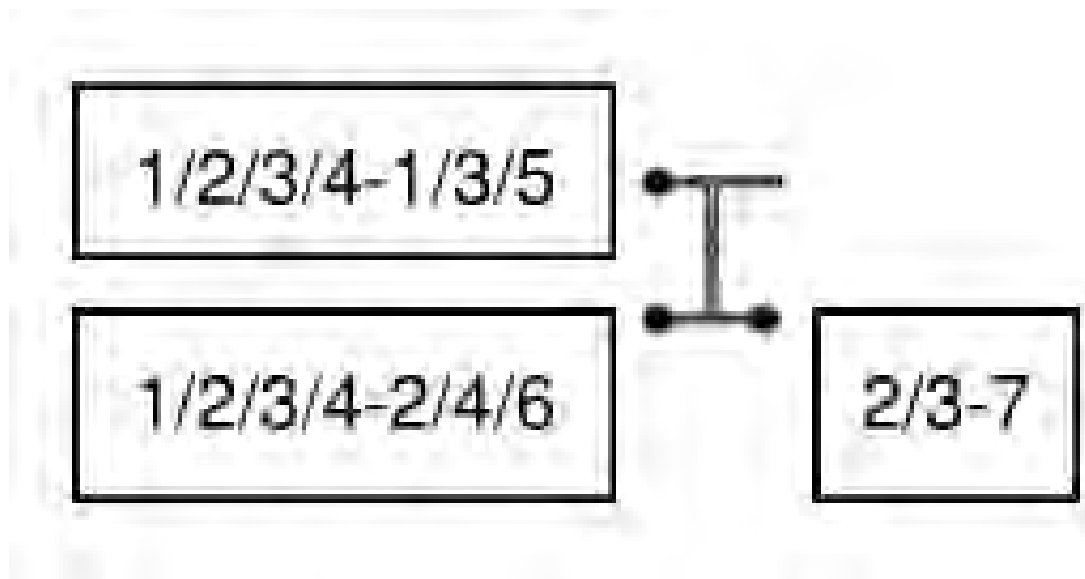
AUNGES Battered Pile Test Bent Cross-section Gage Locations
